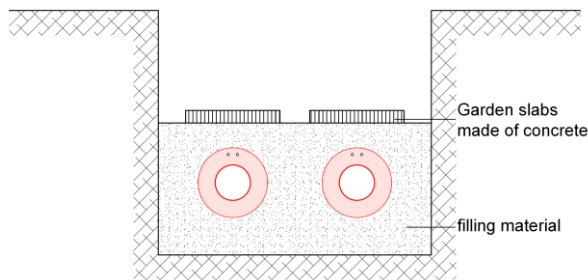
Sample protection against mechanical damage with garden slabs of concrete.
